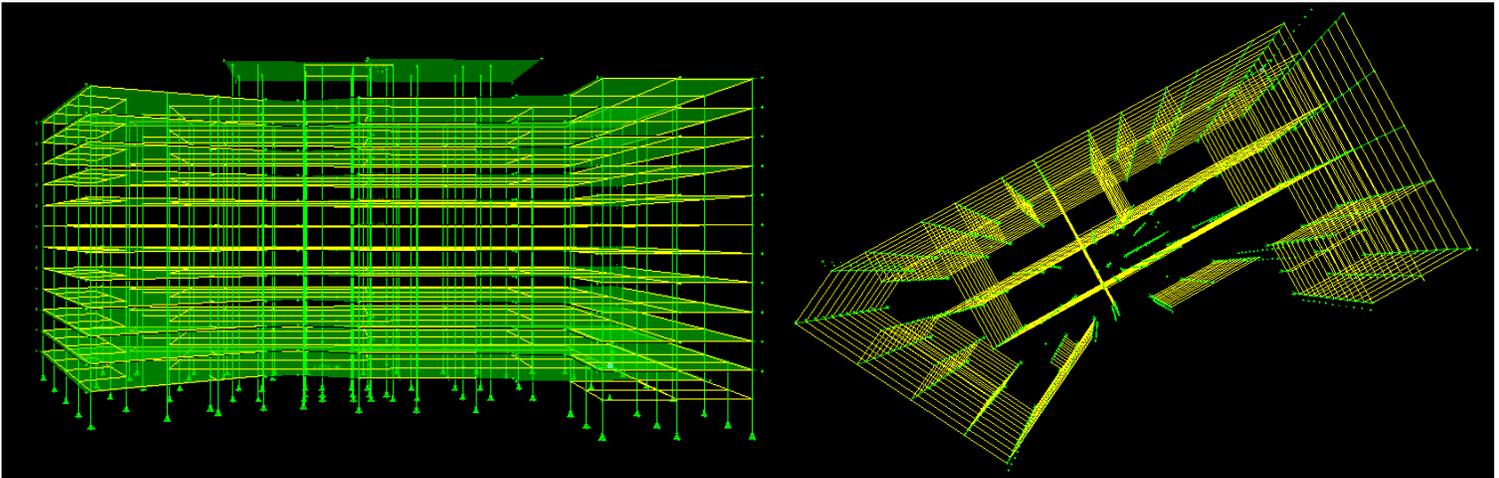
3D perspectives of equivalent frames with rigid diaphragm (left) and bird's eye view of the moment frames (right) where the vertical green lines are the columns and horizontal yellow lines are the beams
